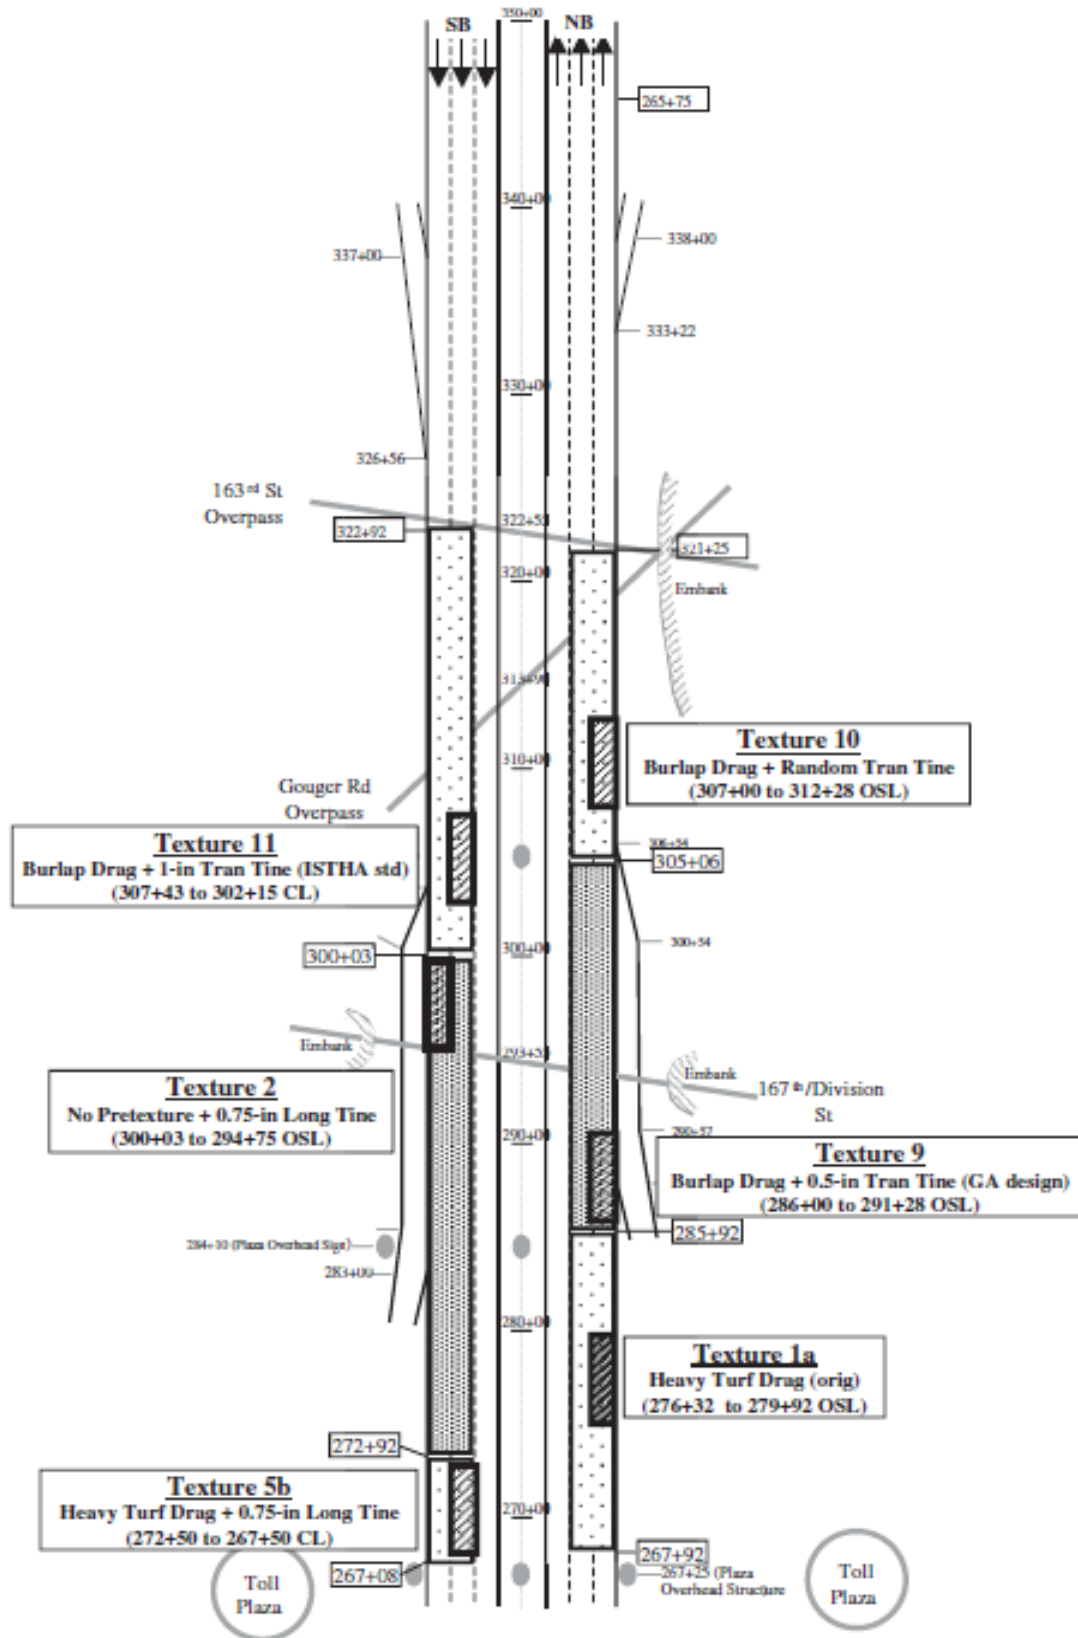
Test Sections Located North of the Toll Plaza¹
